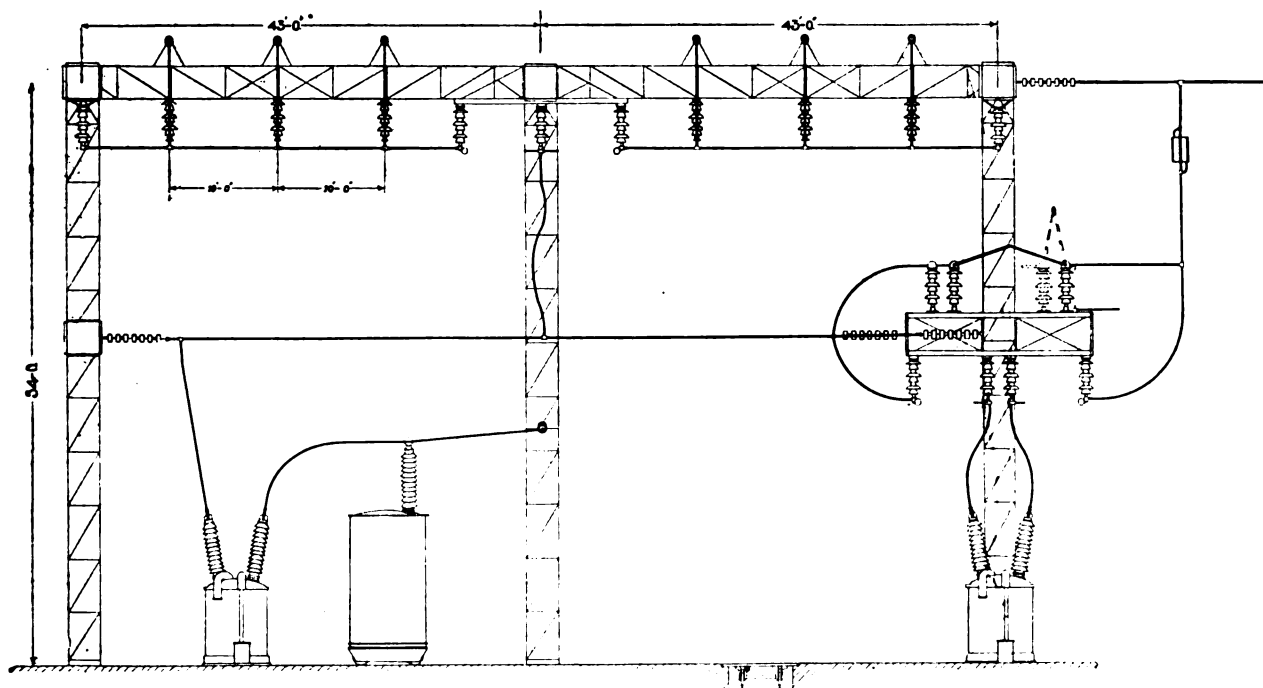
Layout of 135-kV outdoor station. Sectional elevation.
